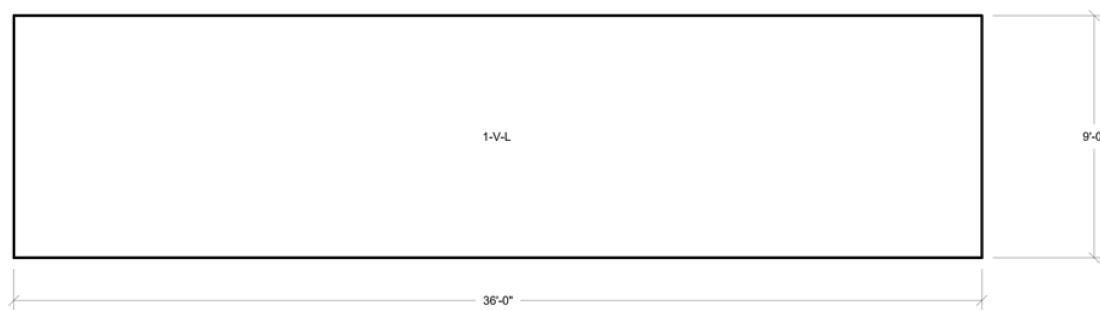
H.7-12 Tunnel Walls Looking From Outside Horizontal Reinforcement Zones Far Side Face
